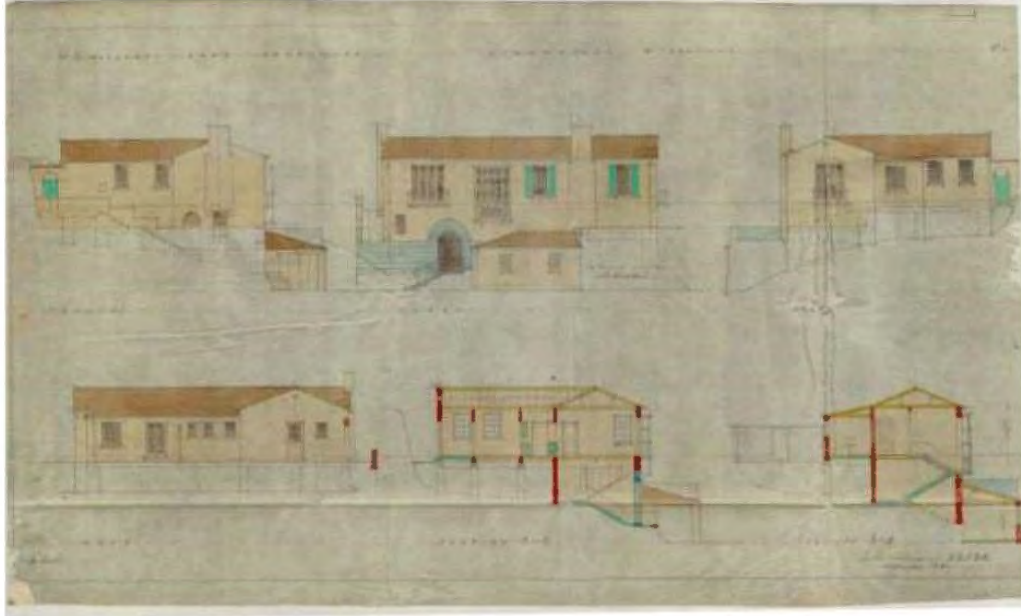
Architectural plans from BA174/1941 (Woollahra Records)
